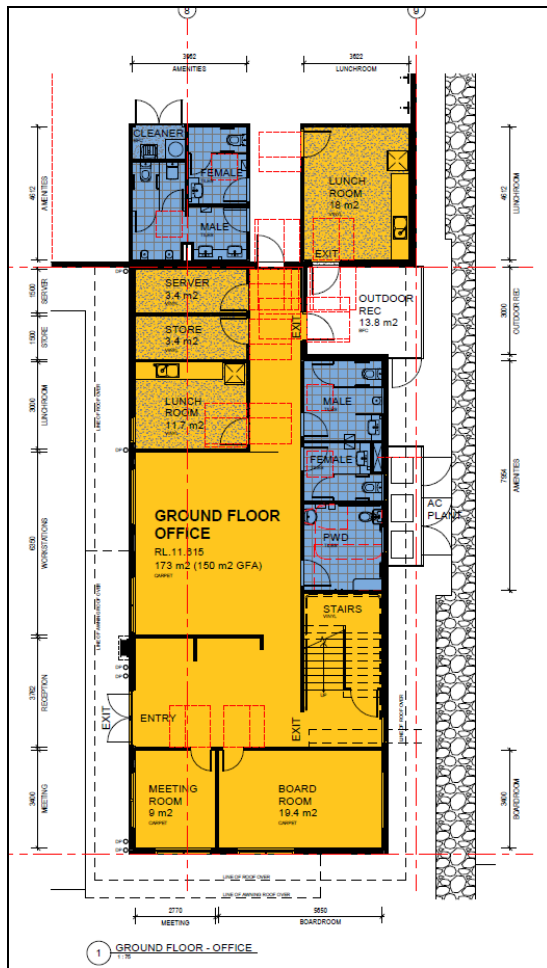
Ground Floor Office Plan (Source: Multi Span Australia Design Construct)
